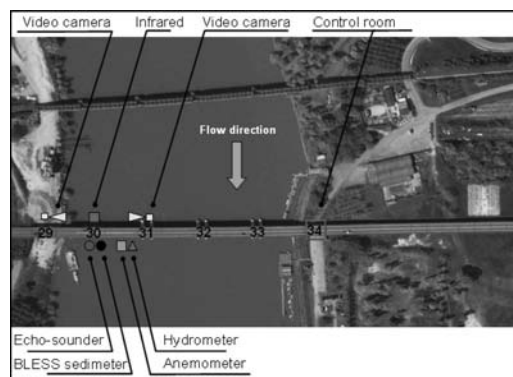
Layout of the monitoring system at Borgoforte bridge.
